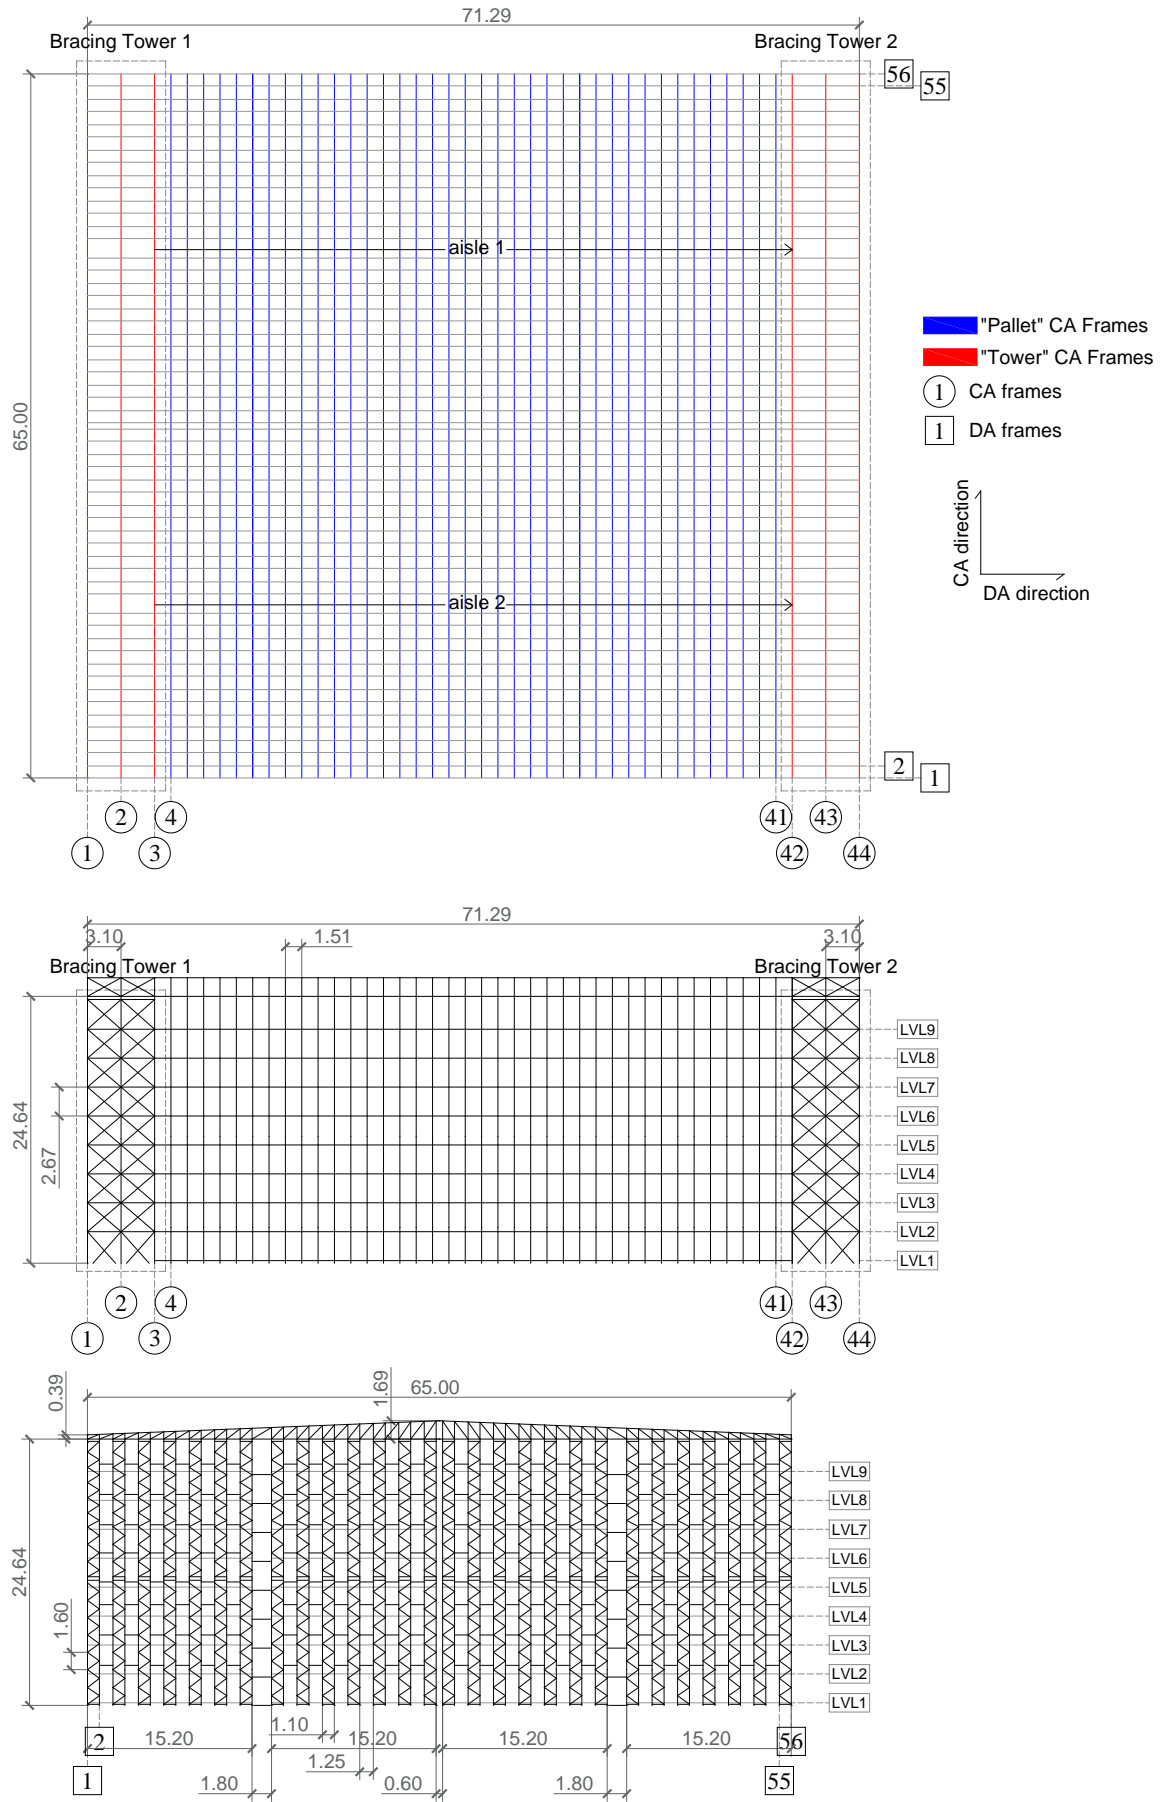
Structural configuration of CS4, showing plan, down- and cross-aisle views.
